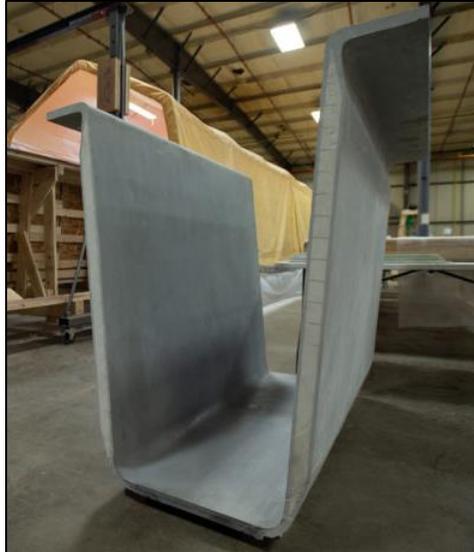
A section of a CT Girder made by AIT. Foam inserts can be seen in the vertical walls of the girder to help reduce the weight (Francis, 2019).
